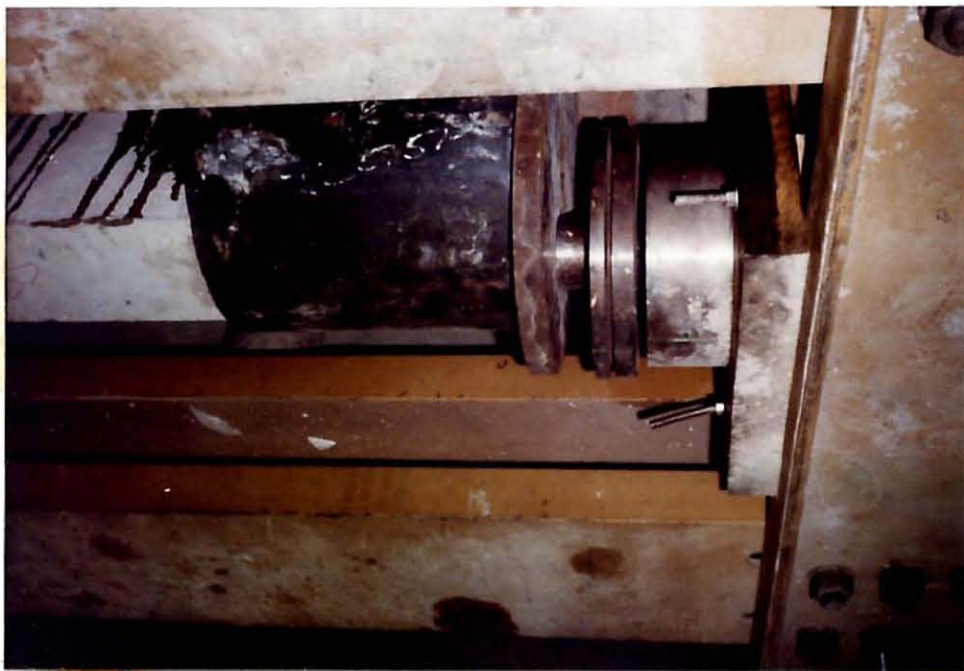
b REDESIGNED BRACKET WITH STEEL TUBE GROUTED WITH CONCRETE
